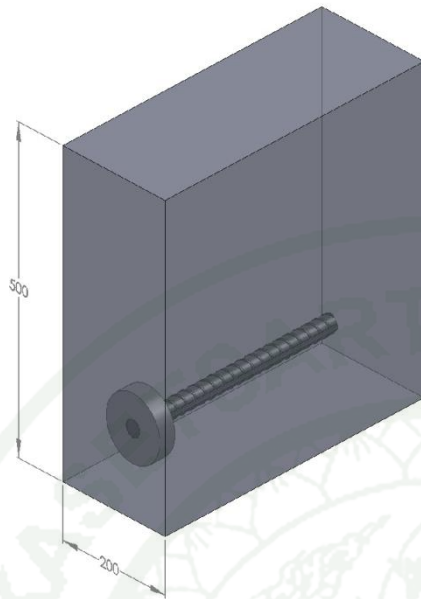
Headed bar dia 20 mm and 32 mm Specimen details
